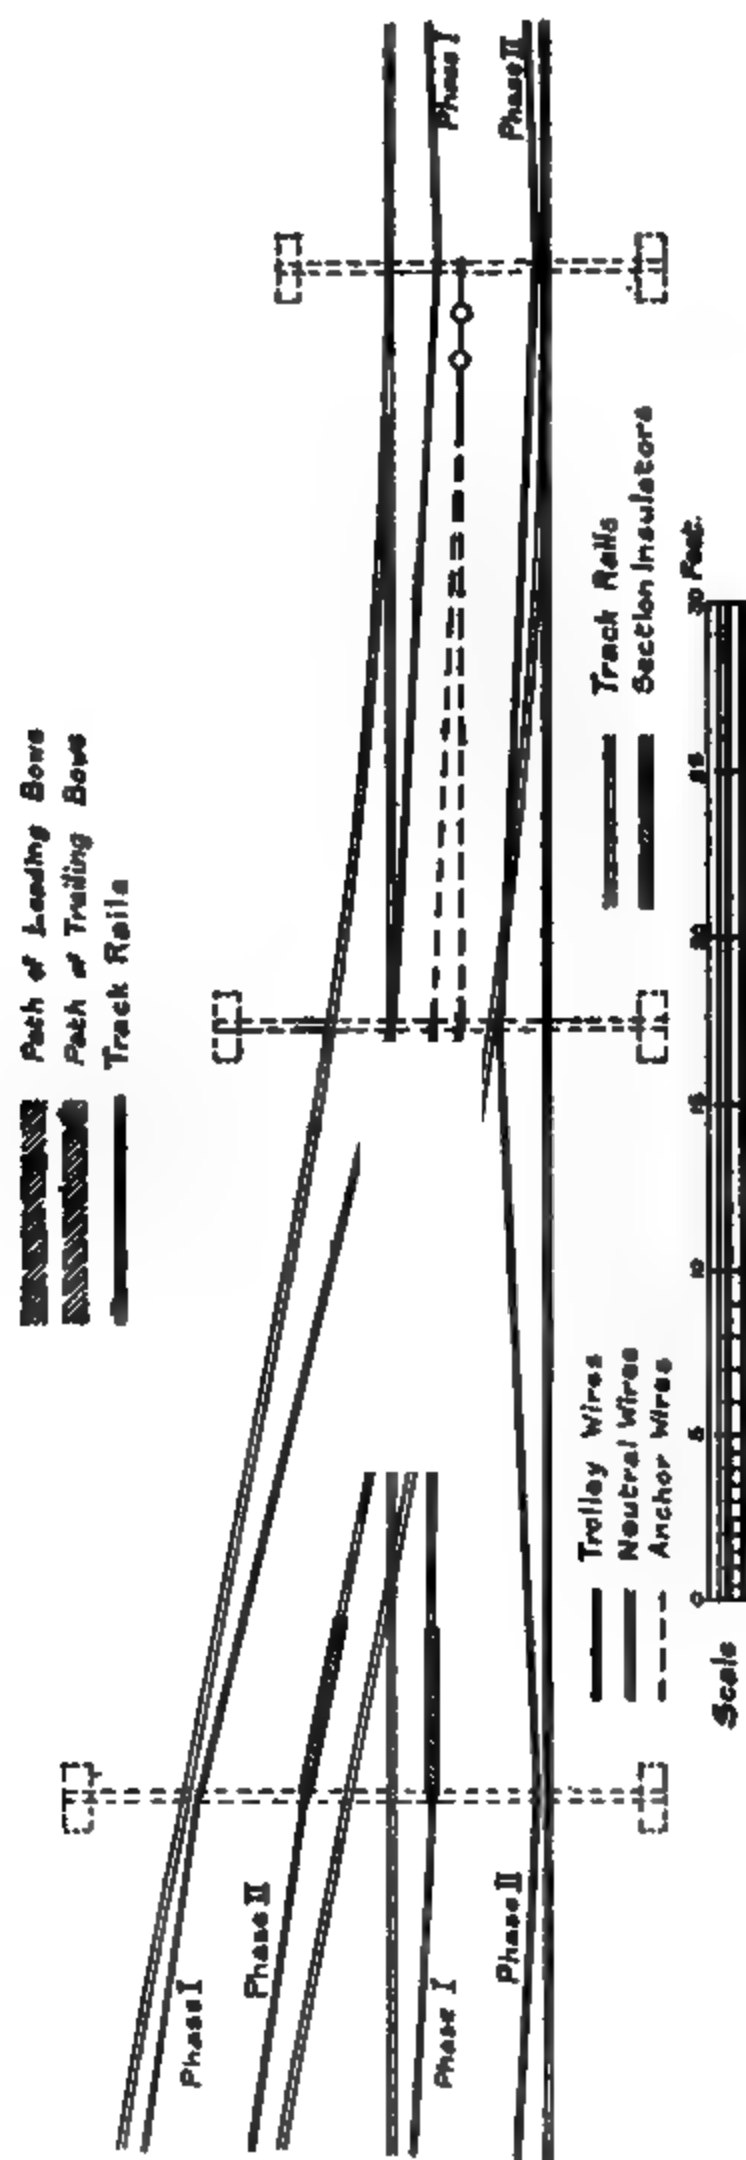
Construction at Single-track Loop (Simplon Tunnel Electrification).
